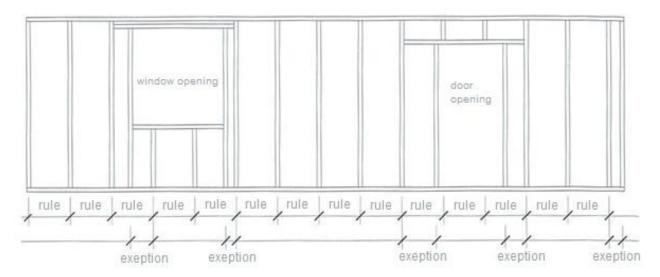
Timber frame construction with openings from basic grid, Source: Peter Cheret u.a. Holzbau Handbuch Reihe 1, Teil 1 Folge 7, Holzrahmenbau, S. 26
